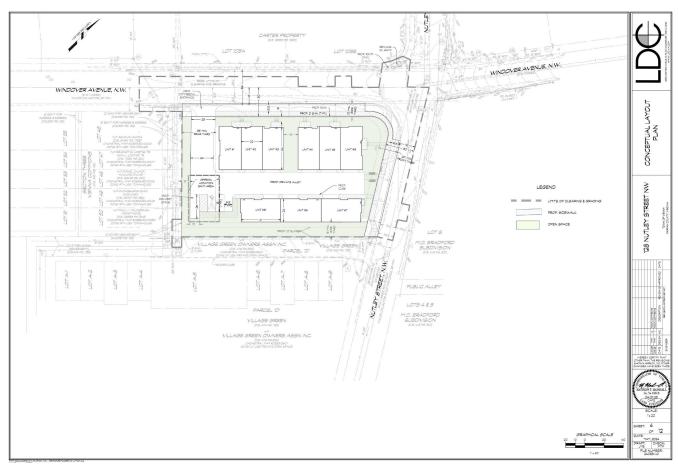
Conceptual Layout Plan (Prepared by LDC)
